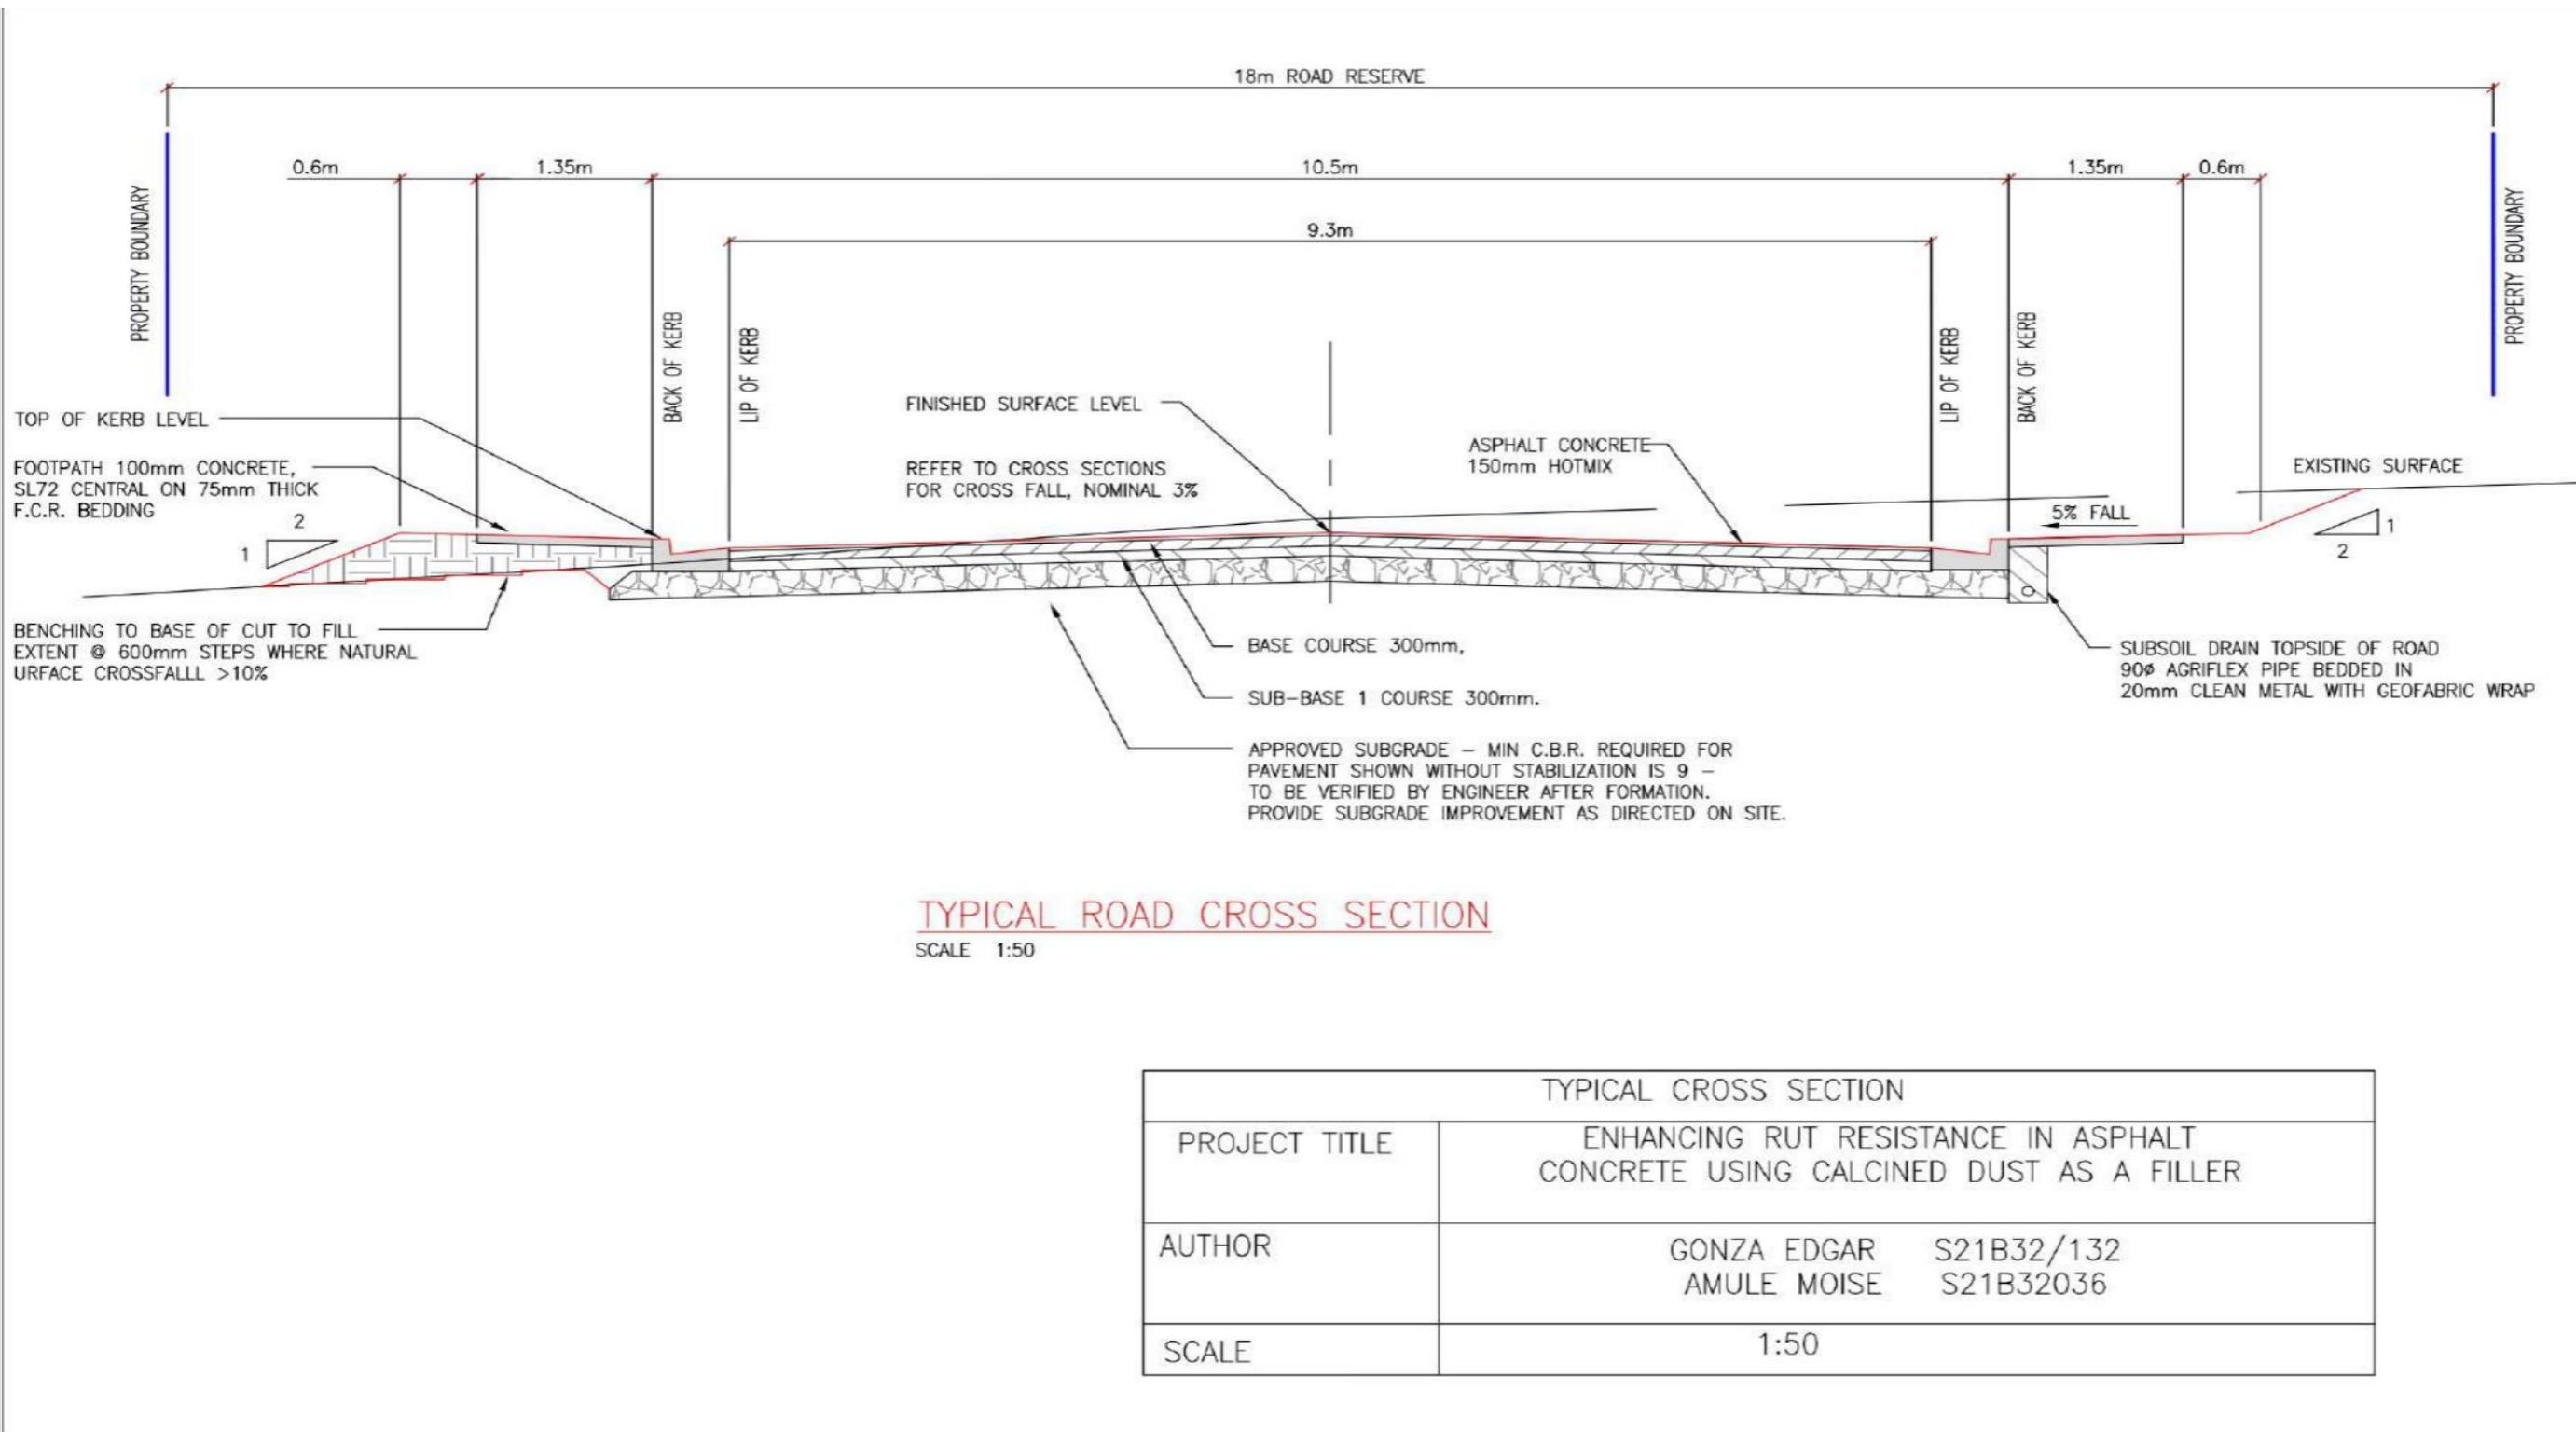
Typical Road Cross Section - ASPHALT CONCRETE-Size Layout
